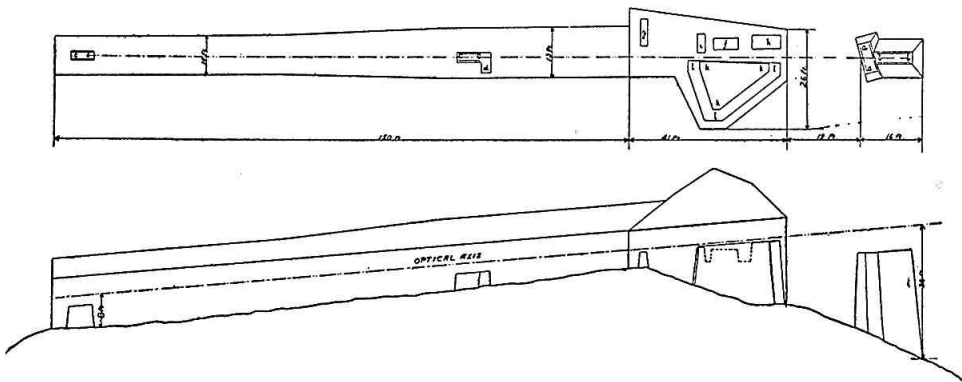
Plan and Elevation of Snow Telescope House on Mount Wilson.
